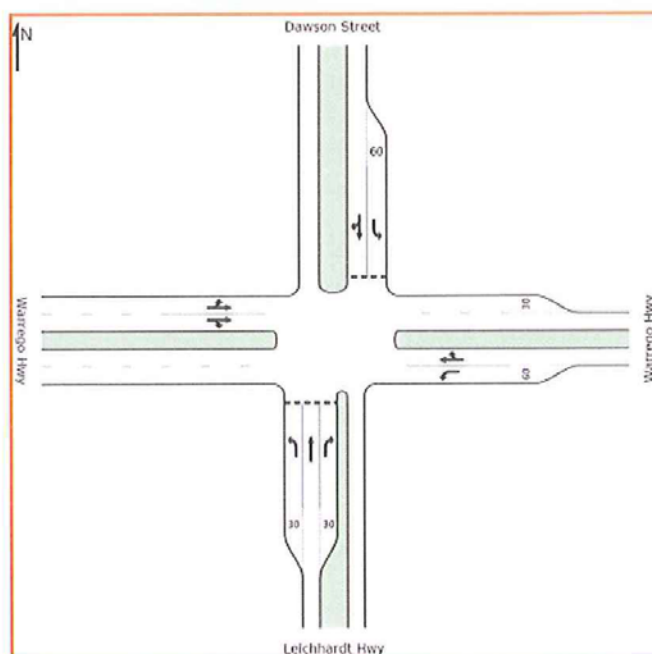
Proposed Alternative Intersection Layout – Option 1
